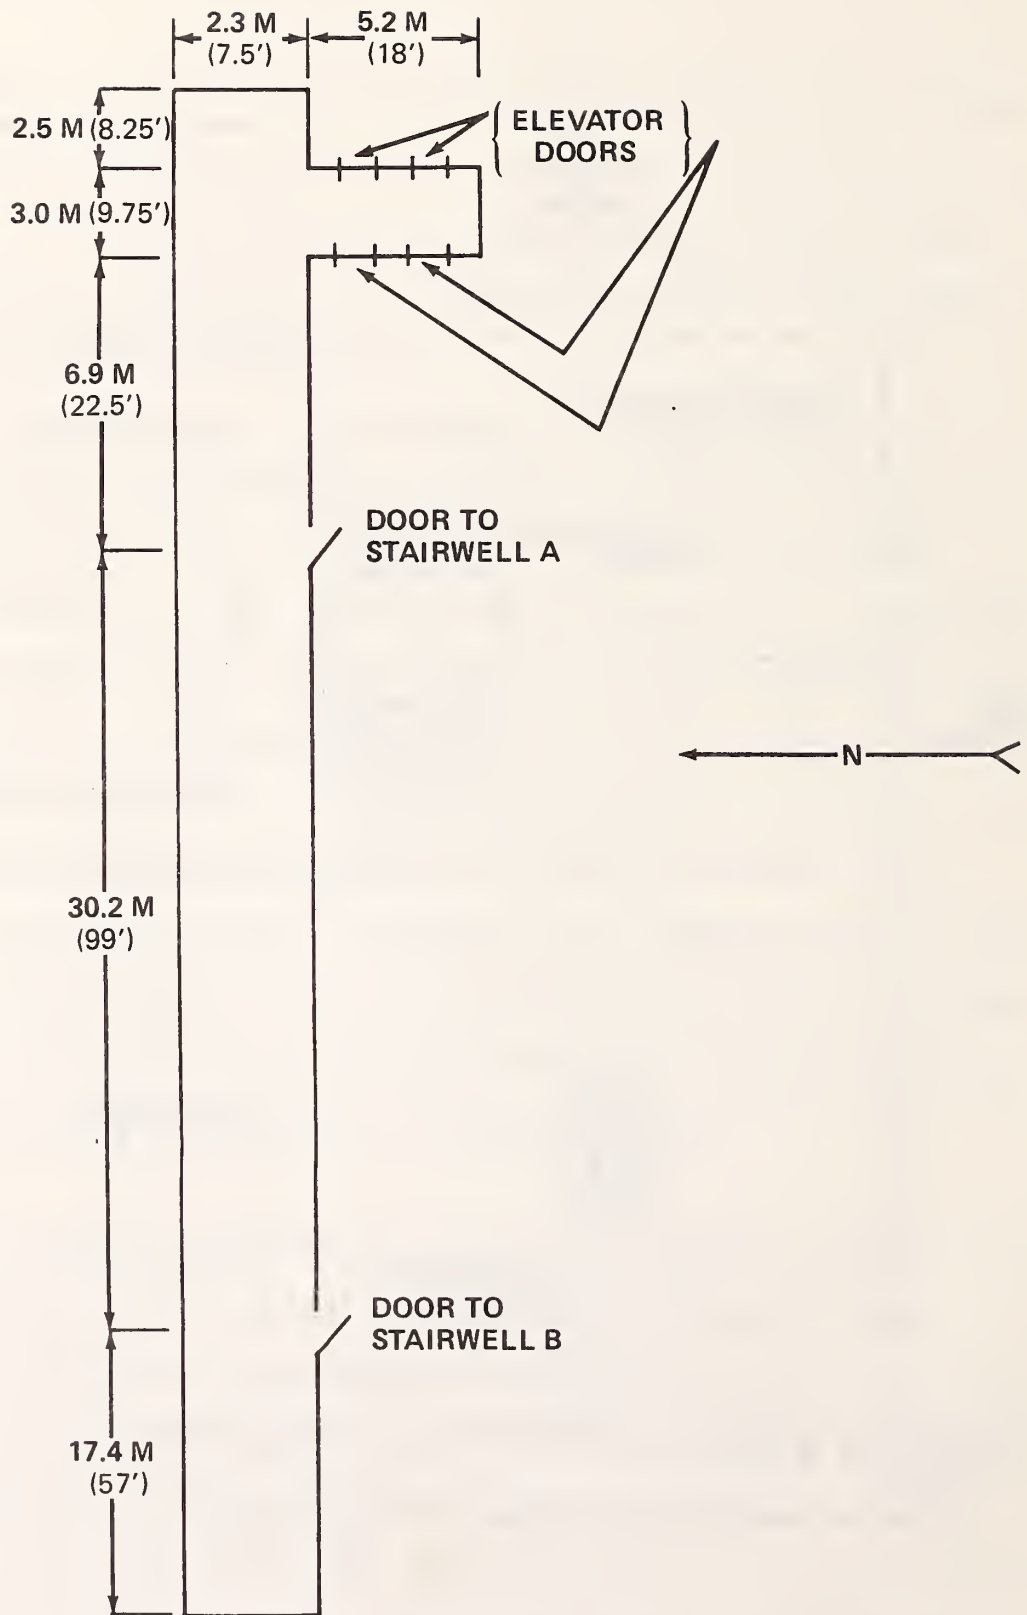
ROUGH SKETCH OF THIRD FLOOR HALL OF BUILDING 101
